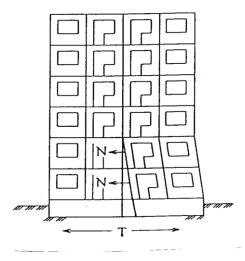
Building deformation behavior in lower storeys caused by elongation of foundation.
